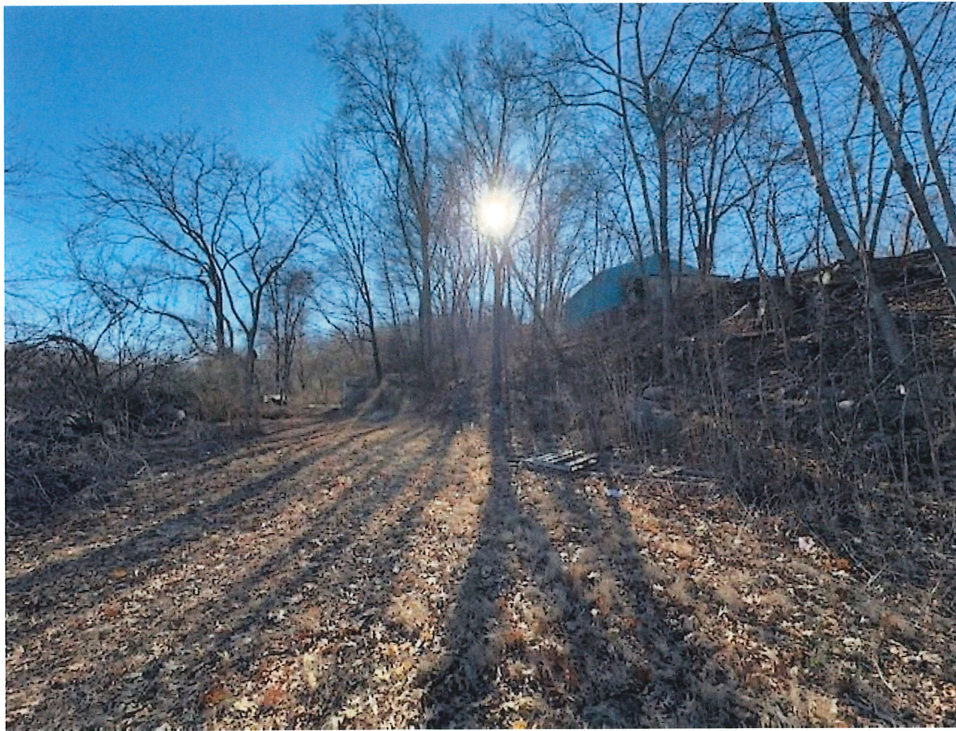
Example of the wooded hillside which will have the grades cut down to provide a level parking lot.
